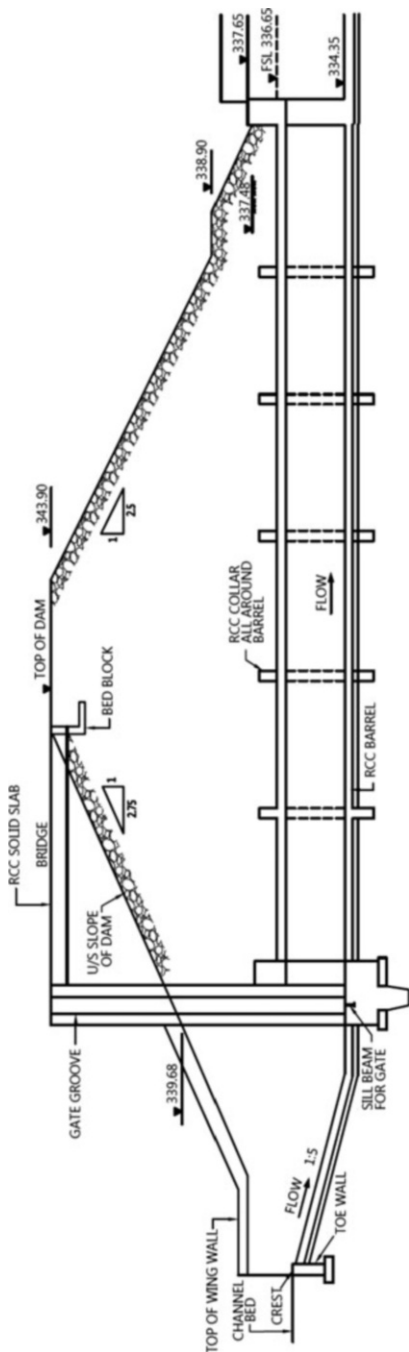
Outlet barrel with collars in an earthen dam.
